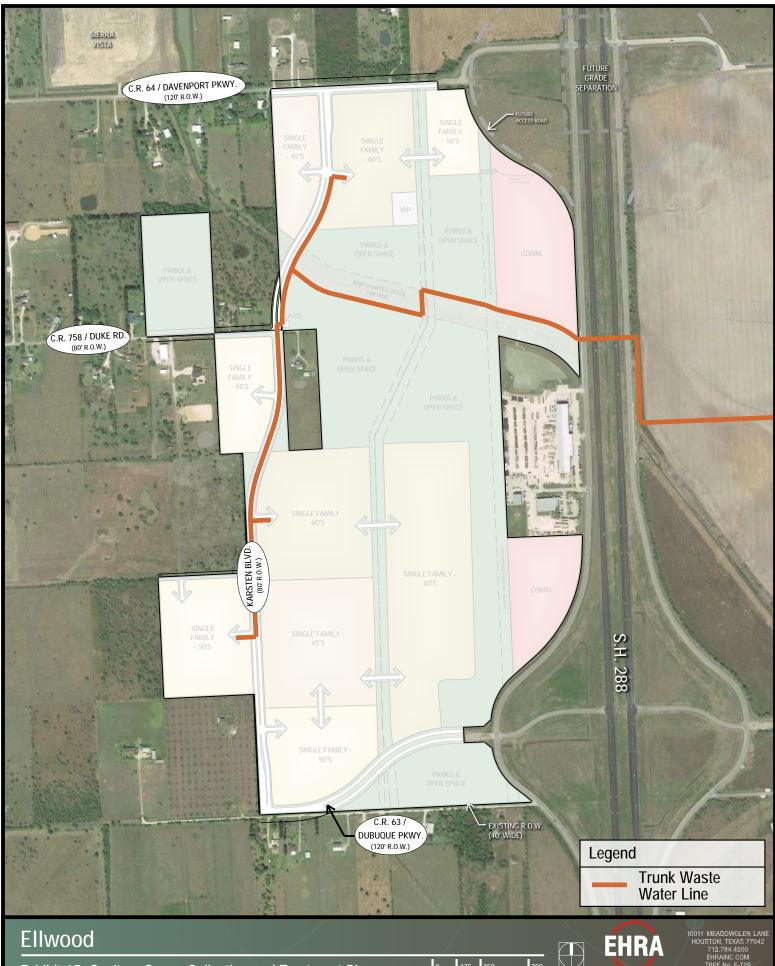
Sanitary Sewer Collection and Treatment Plan
